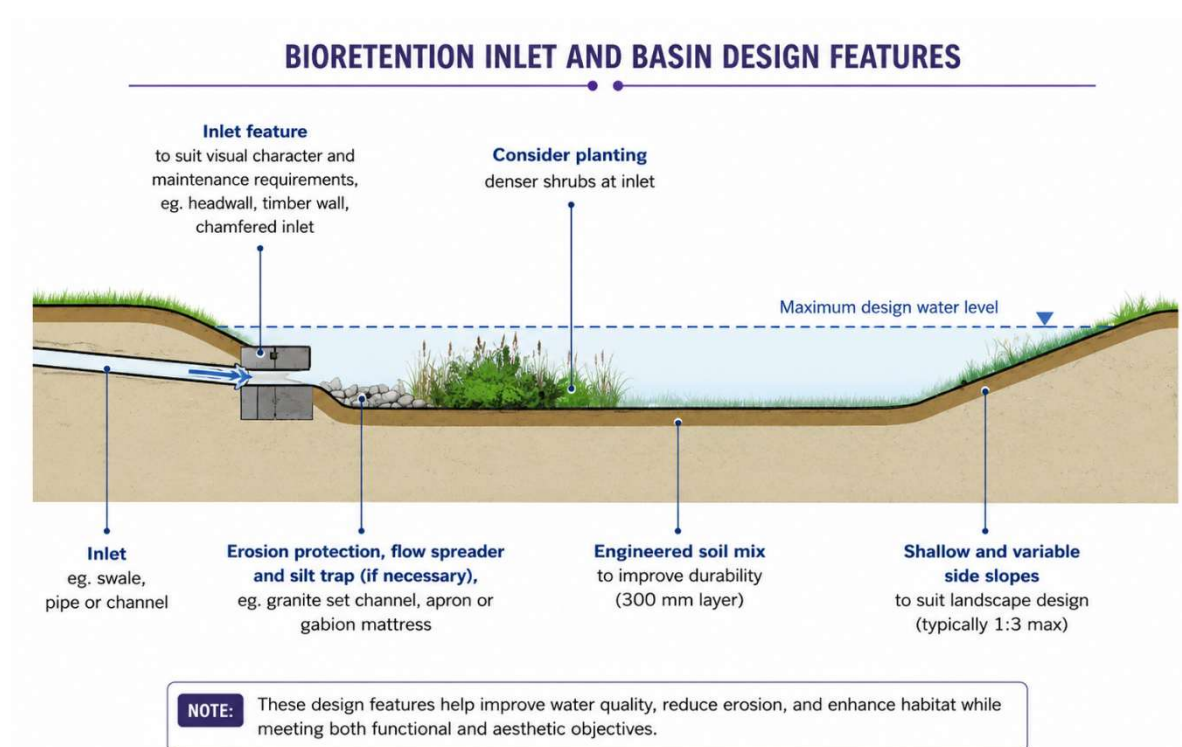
Schematic section of a bioretention basin showing the inlet arrangement, temporary ponding area, engineered soil layer, vegetation, erosion protection, and maximum design water level.
